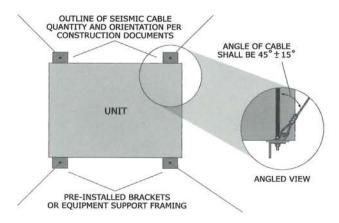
Plan view of vibration-isolated, suspended attachment to the building structure.
